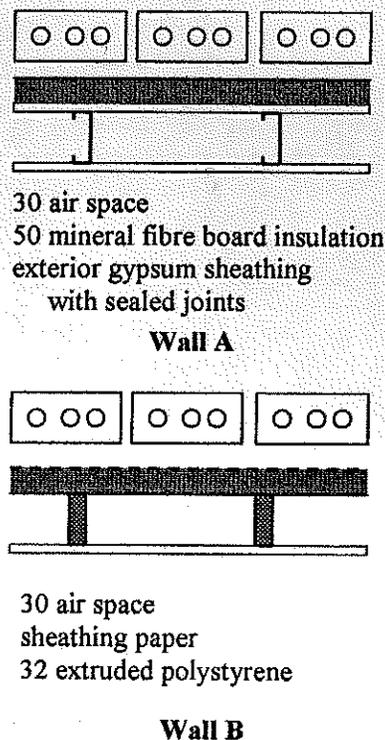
Simplified wall cross sections: painted interior drywall and 6 mille poly were common to both systems.
